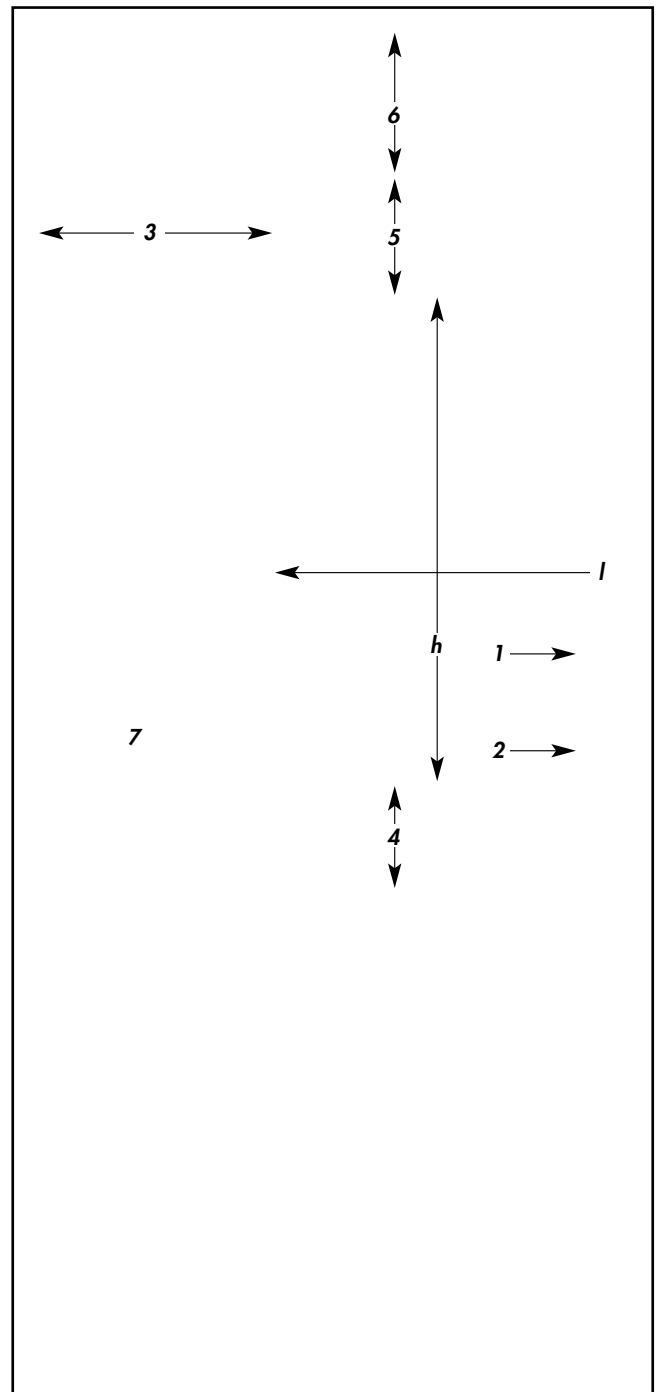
Back scoring and blanking pattern of a Mirasystem panel
